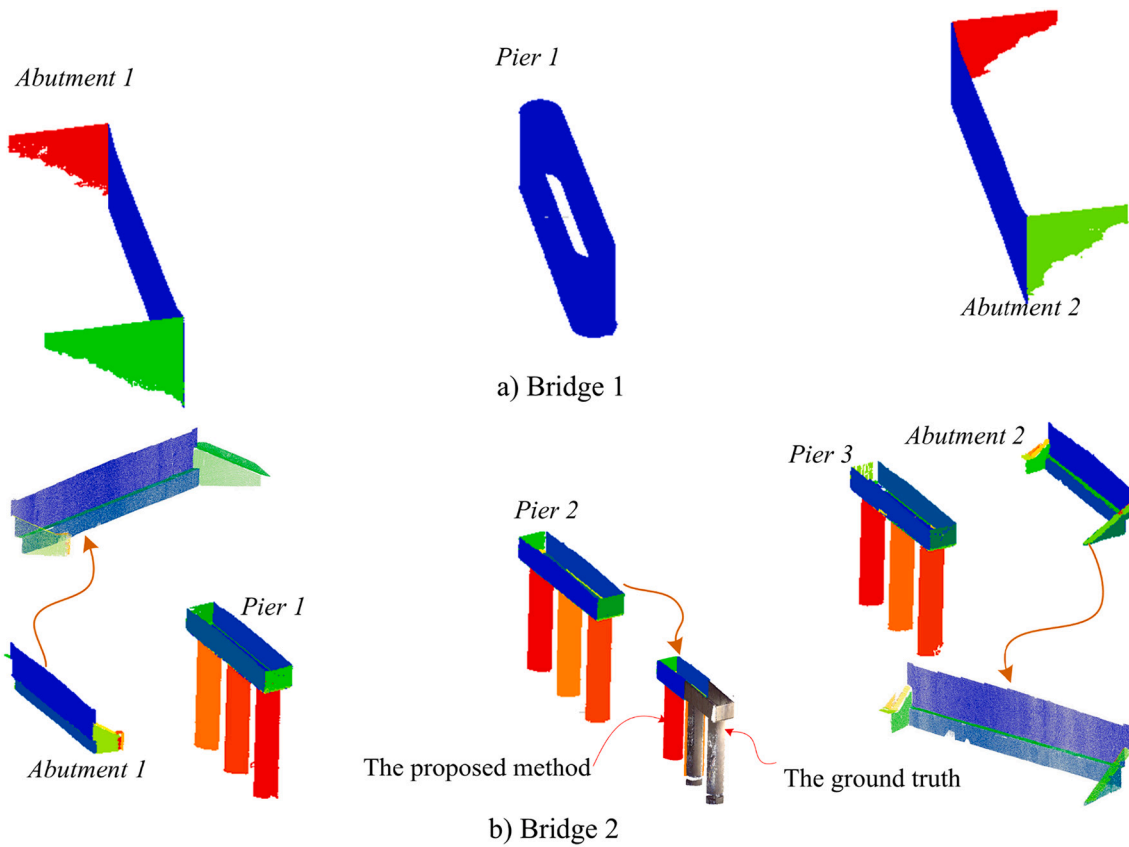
Resulting surfaces of the abutments and piers for Bridge 1 and 2.
